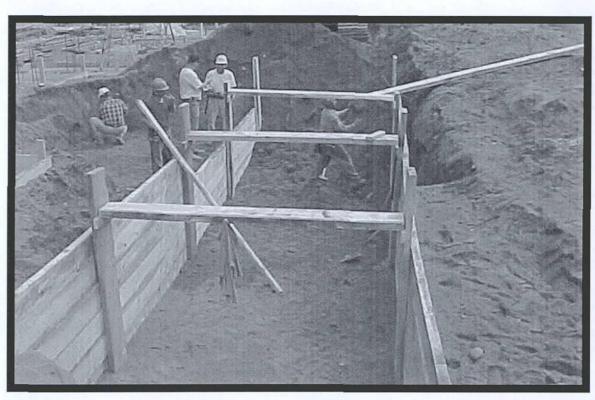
Monitoring of Footing Excavation for Column Supports, View Looking East.
